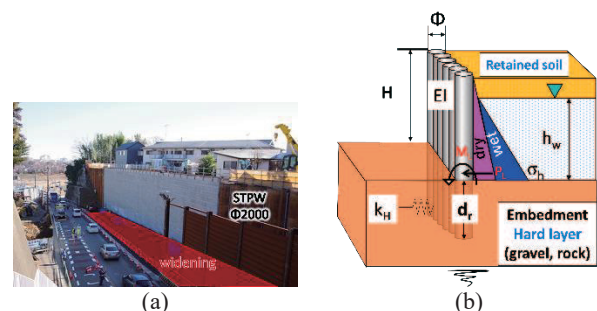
(a) Real application of CSTP wall in Japan (Kitamura and Kitamura, (2019)) (b) Typical CSTP wall.
